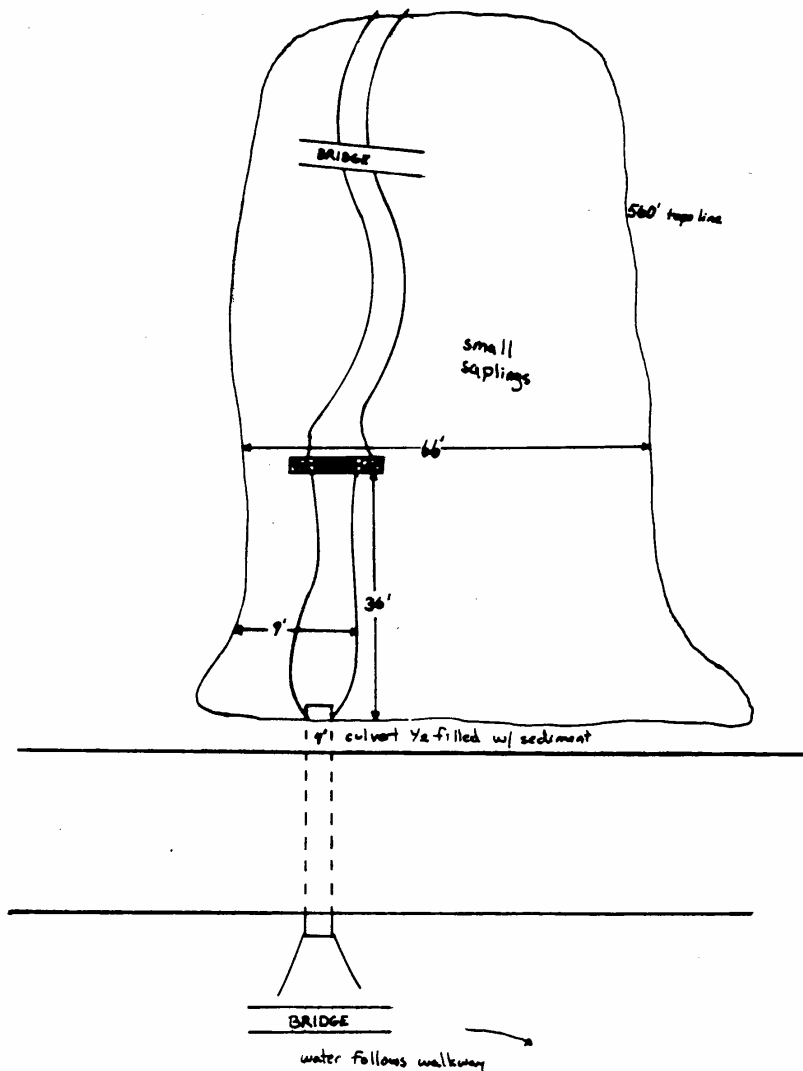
(a). Plan view of check dam and surroundings at Site 1.
